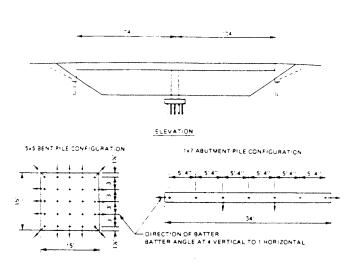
Bridge pile foundation configurations (After Lam et. al., 1987)
